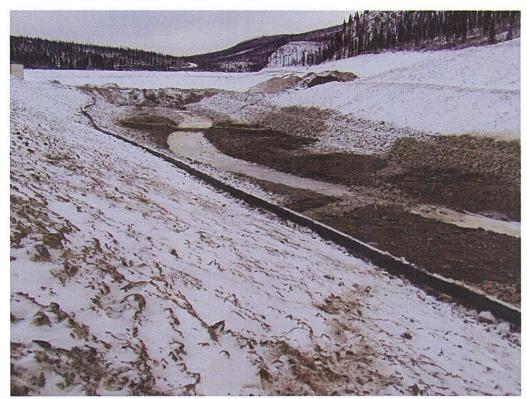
View of upstream portion of completed channel, erosion protection and riffles 1 & 2, Dec. 9, 2003.
